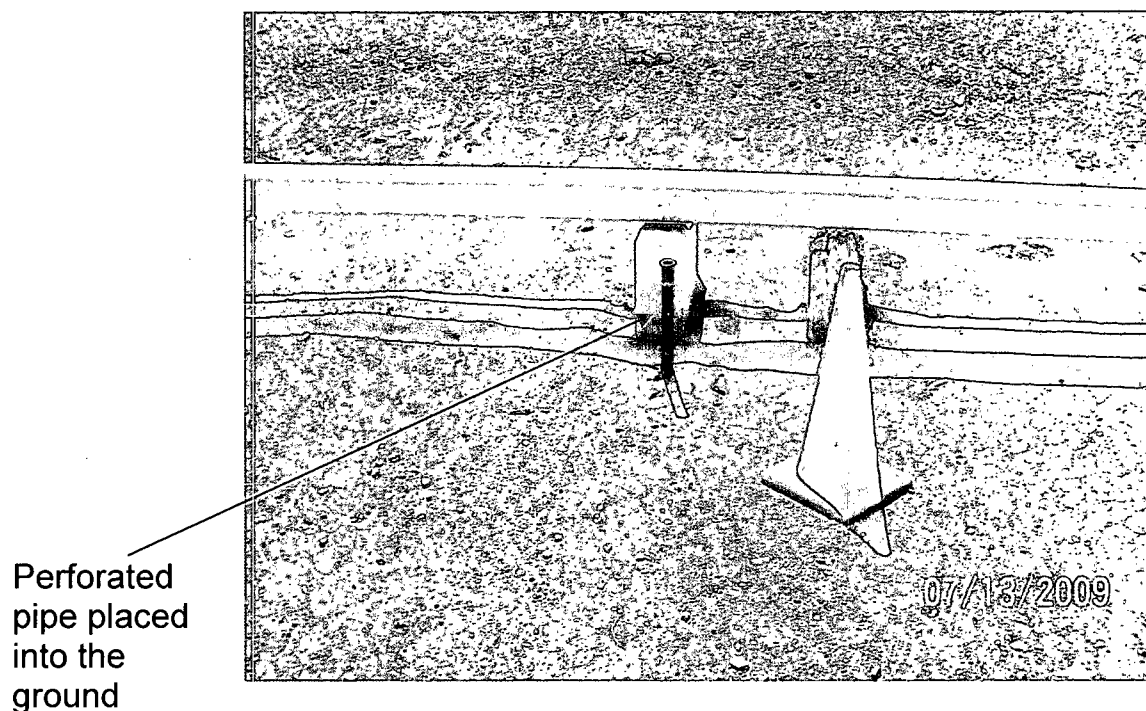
Photograph of emplaced pipe – the section with holes is inside the ground
